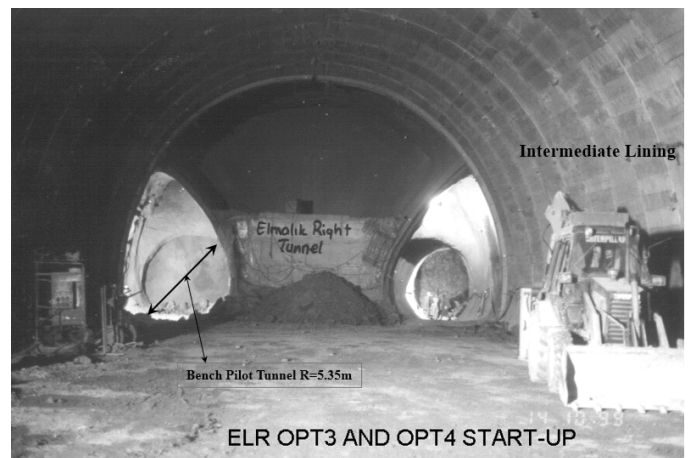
OP-4 support class the regular BPT (bench Pilot Tunnels) are two tunnels having cross section of a circular shape, with a theoretical internal radius of 2.55 m. BPT are parallel driven, with about 18.50 m distance between two BPT center lines.
